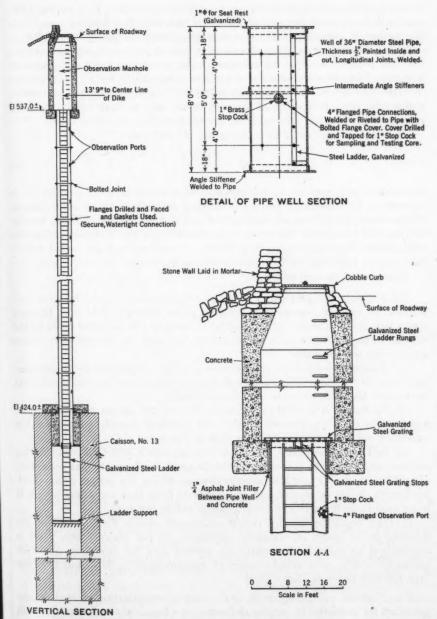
DETAILS AND SECTIONS OF OBSERVATION WELL
